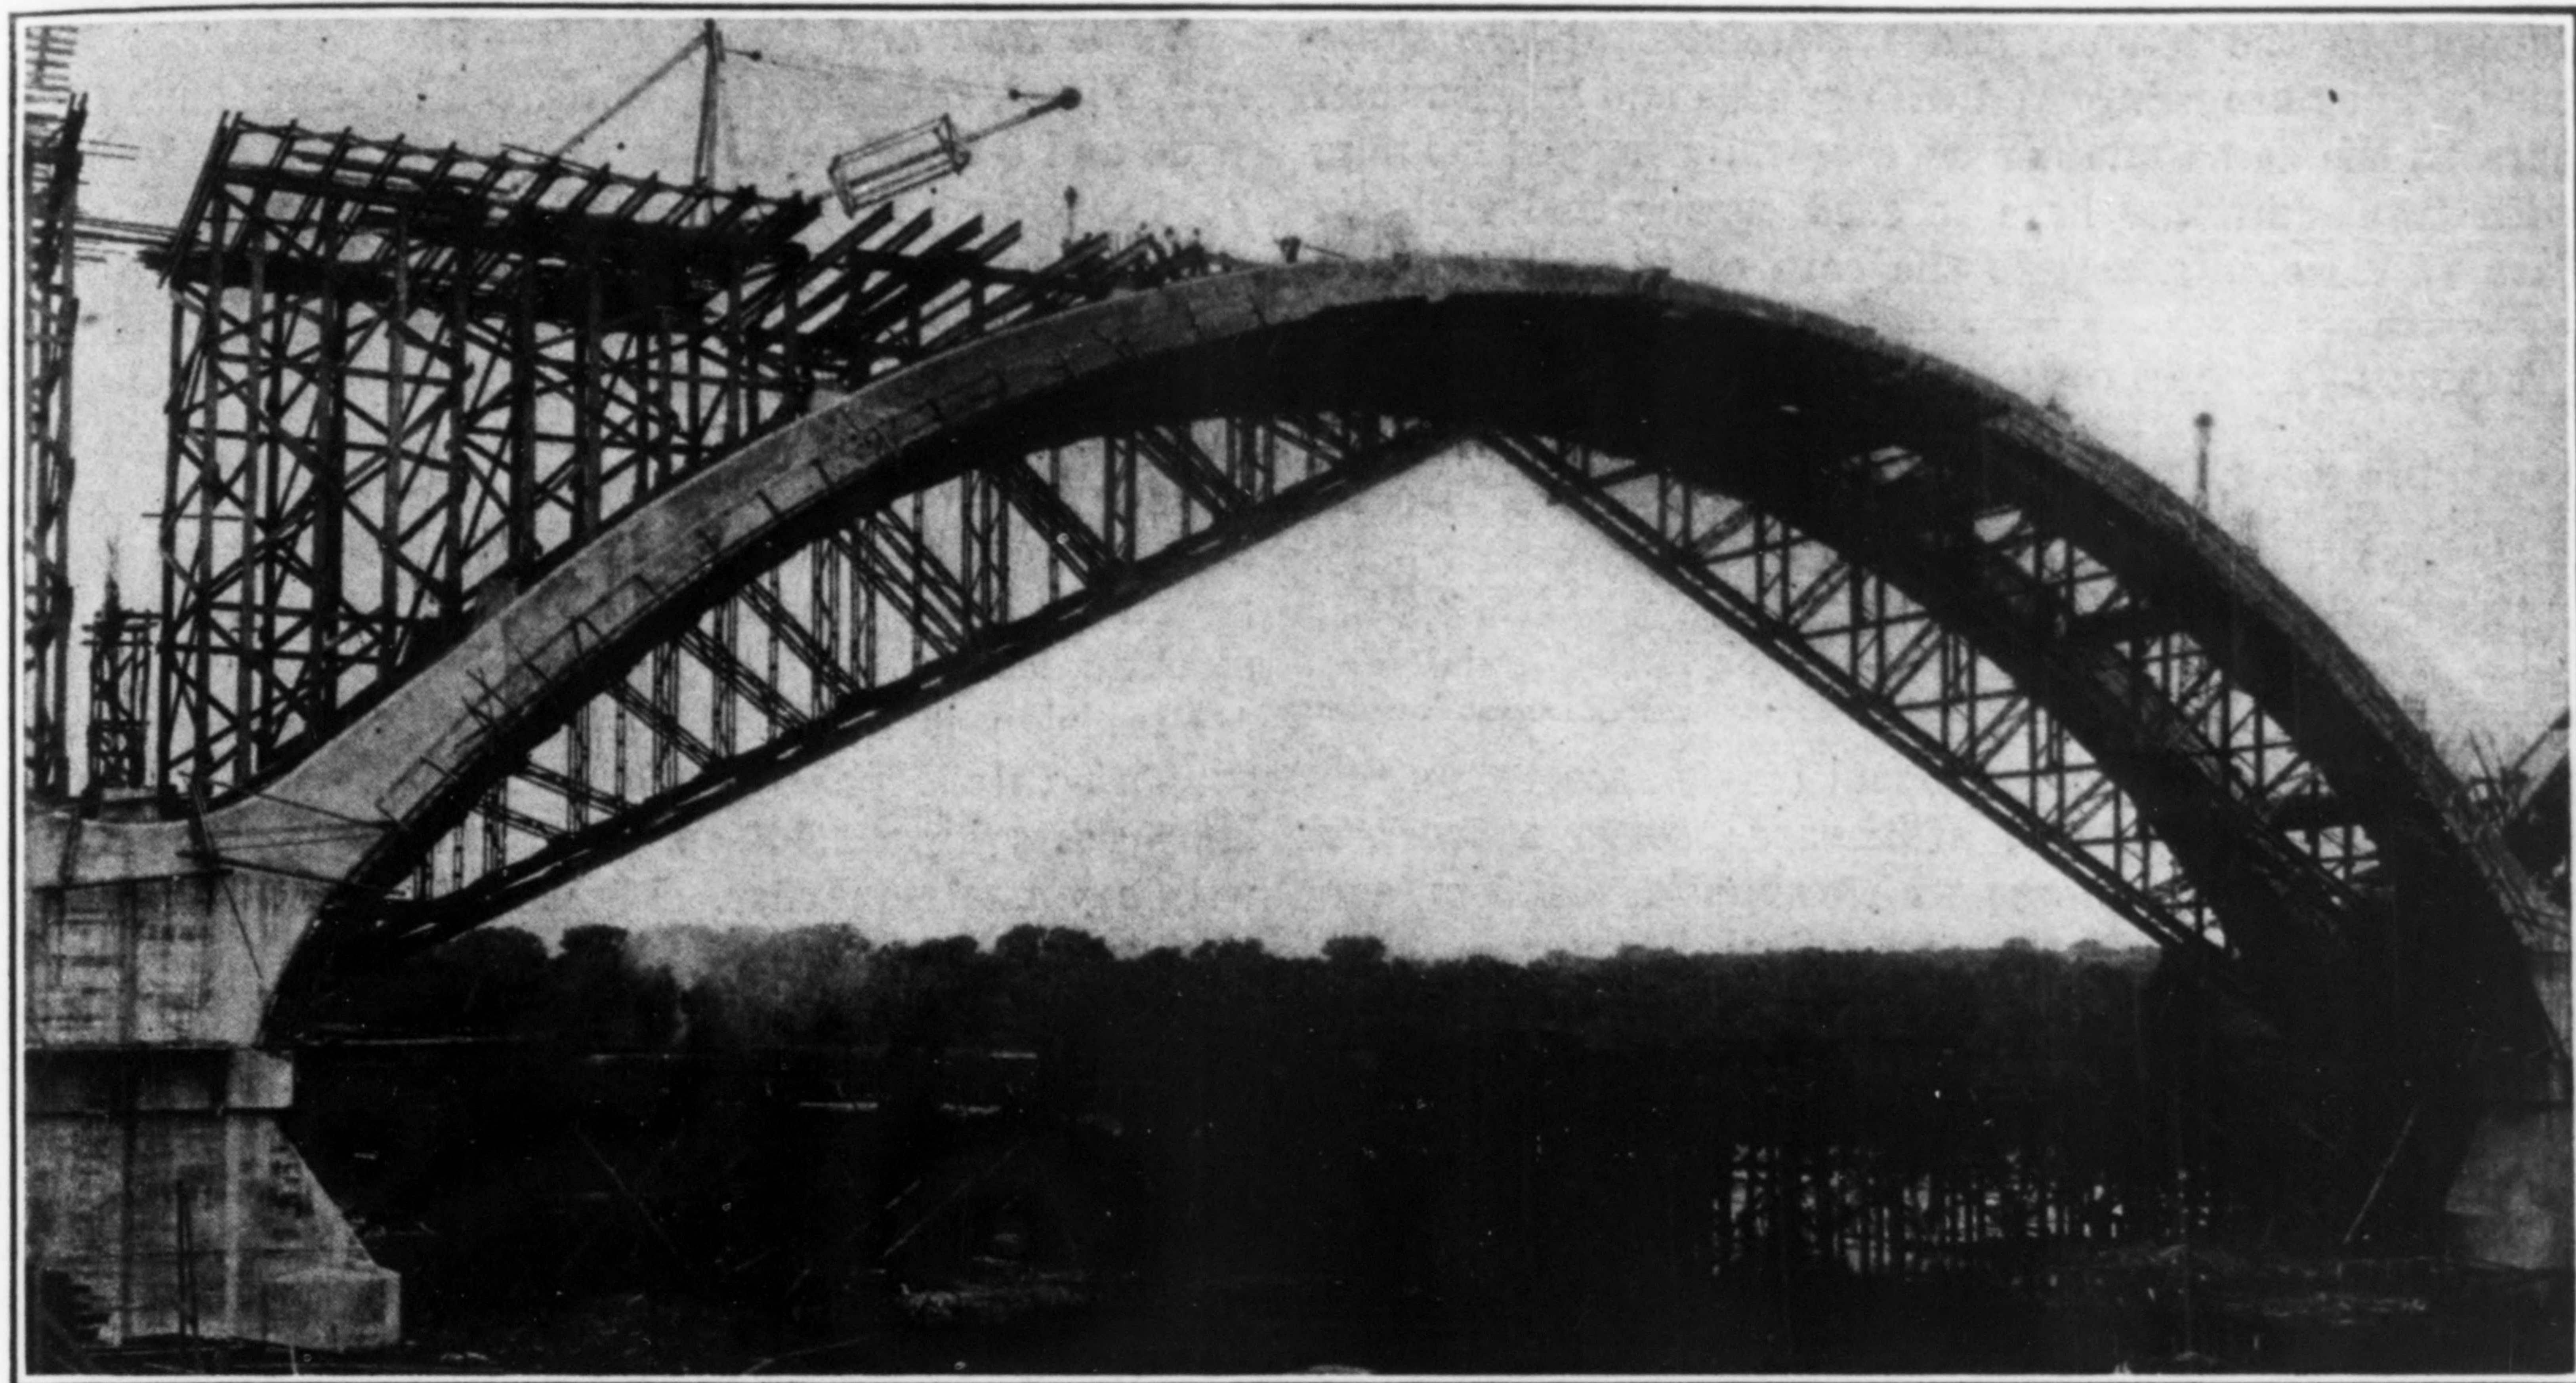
COMPLETED ARCH RIBS ON STEEL CENTERS
